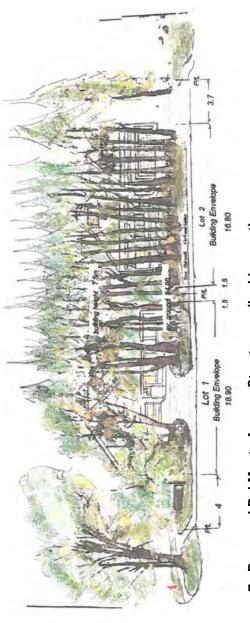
Proposed Del Monte Avenue Streetscape (looking east)
